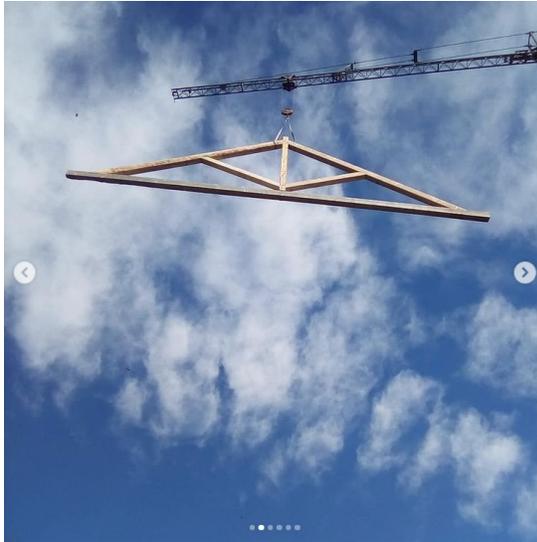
Church Ameno Novara de San Rocco assembling of all trusses and construction with altitude.
